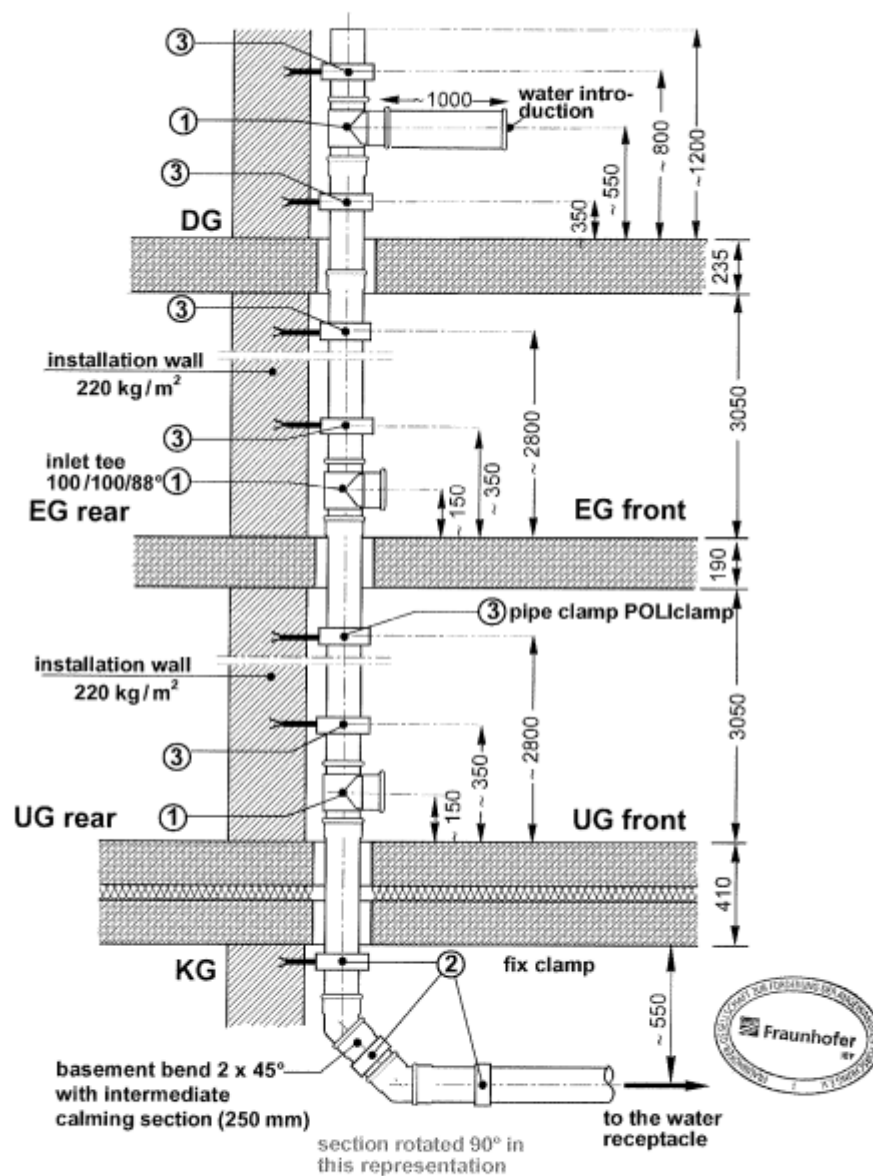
Installation plan of the pipe system "dBlue" (manufacturer: Poliplast), mounted with clamps "POLIclamp" (drawing not to scale, dimensions in mm).
